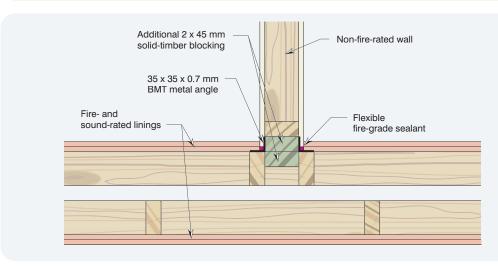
Non-fire-rated single stud wall abutting fire- and sound-rated double stud wall using timber blocks – FRL 90 minutes – plan view
